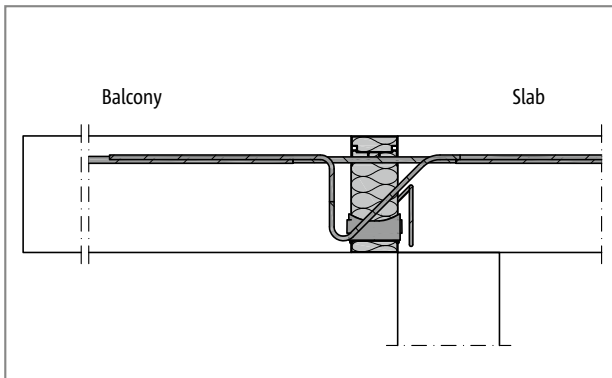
Schöck Isokorb® T type K-E, K-T for R0 without fire protection
